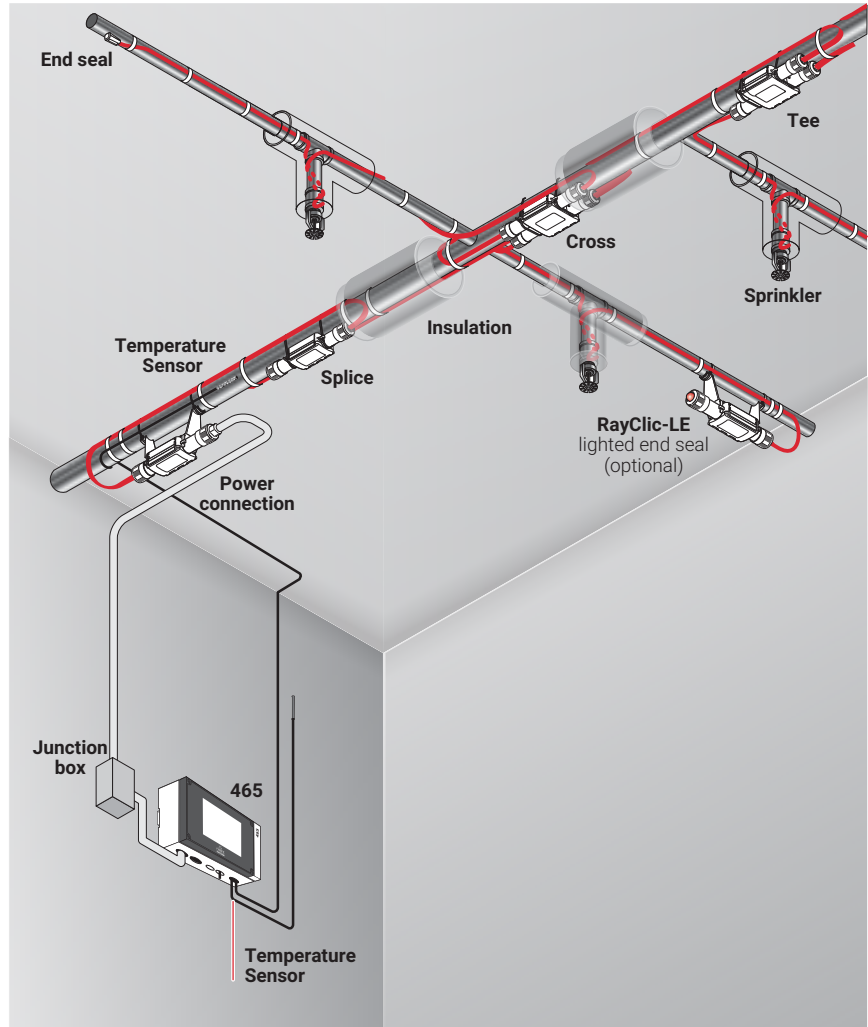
Typical fire suppression system for branch lines with sprinklers
